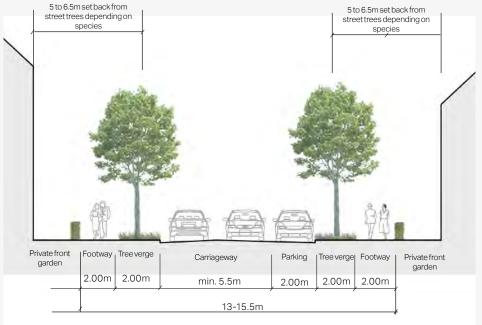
Cross-section to illustrate some dimensions for secondary streets.
